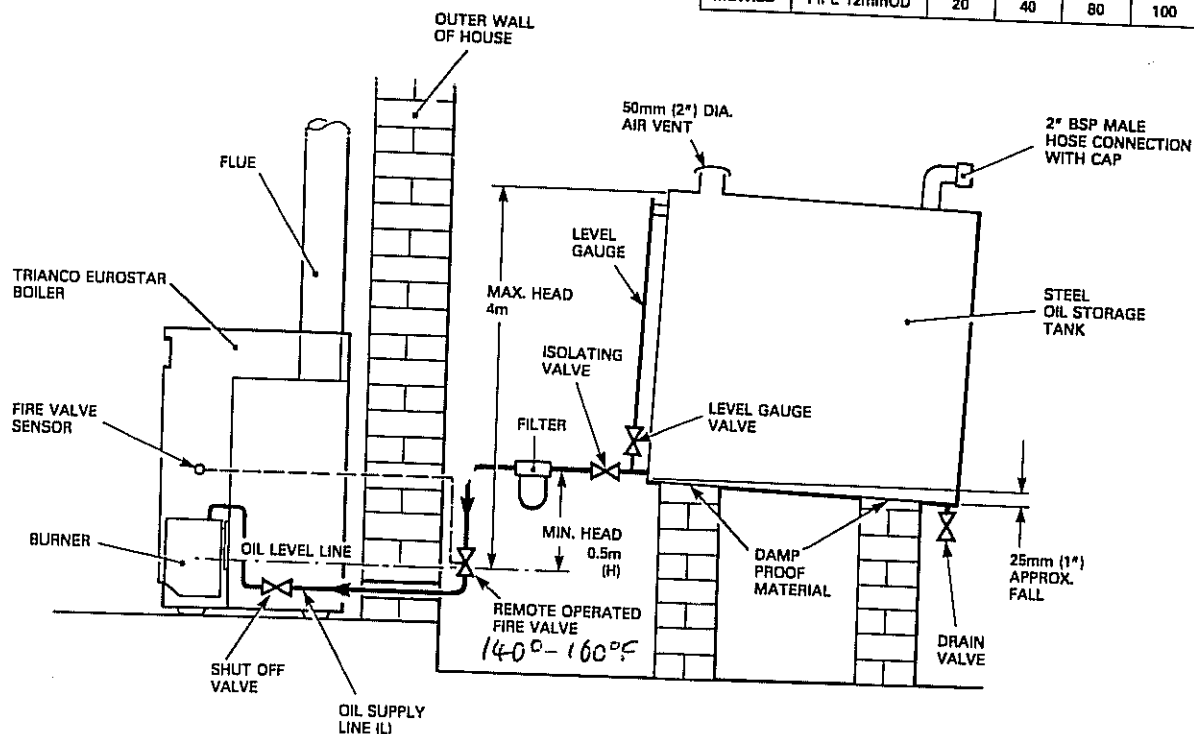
SINGLE PIPE OIL SUPPLY INSTALLATION
